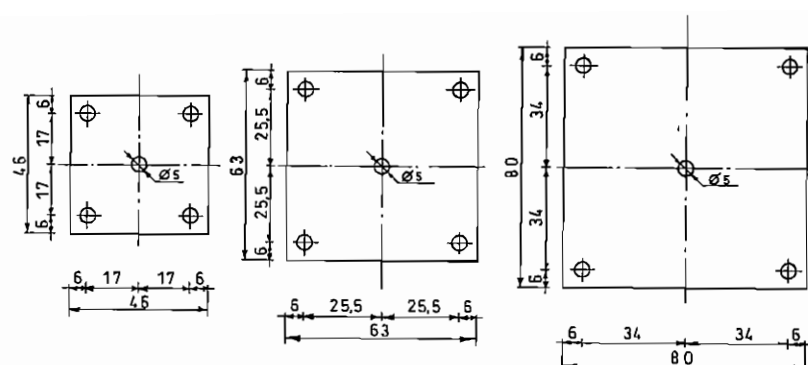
Model footings in plan. Dimensions given in cm. (a) footing used for Test series T1; (b) for Test series T2; (c) for Test series T3.
